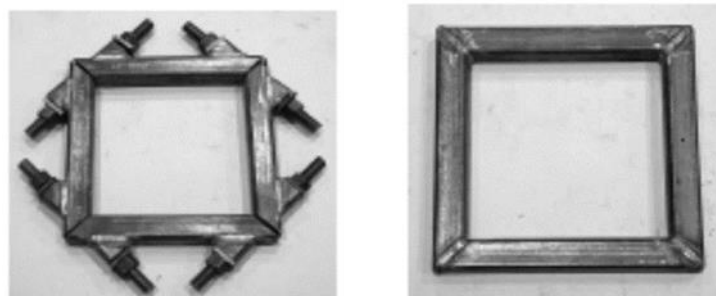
Bolted collar and welded collar (Hussain and Driver, 2005)
